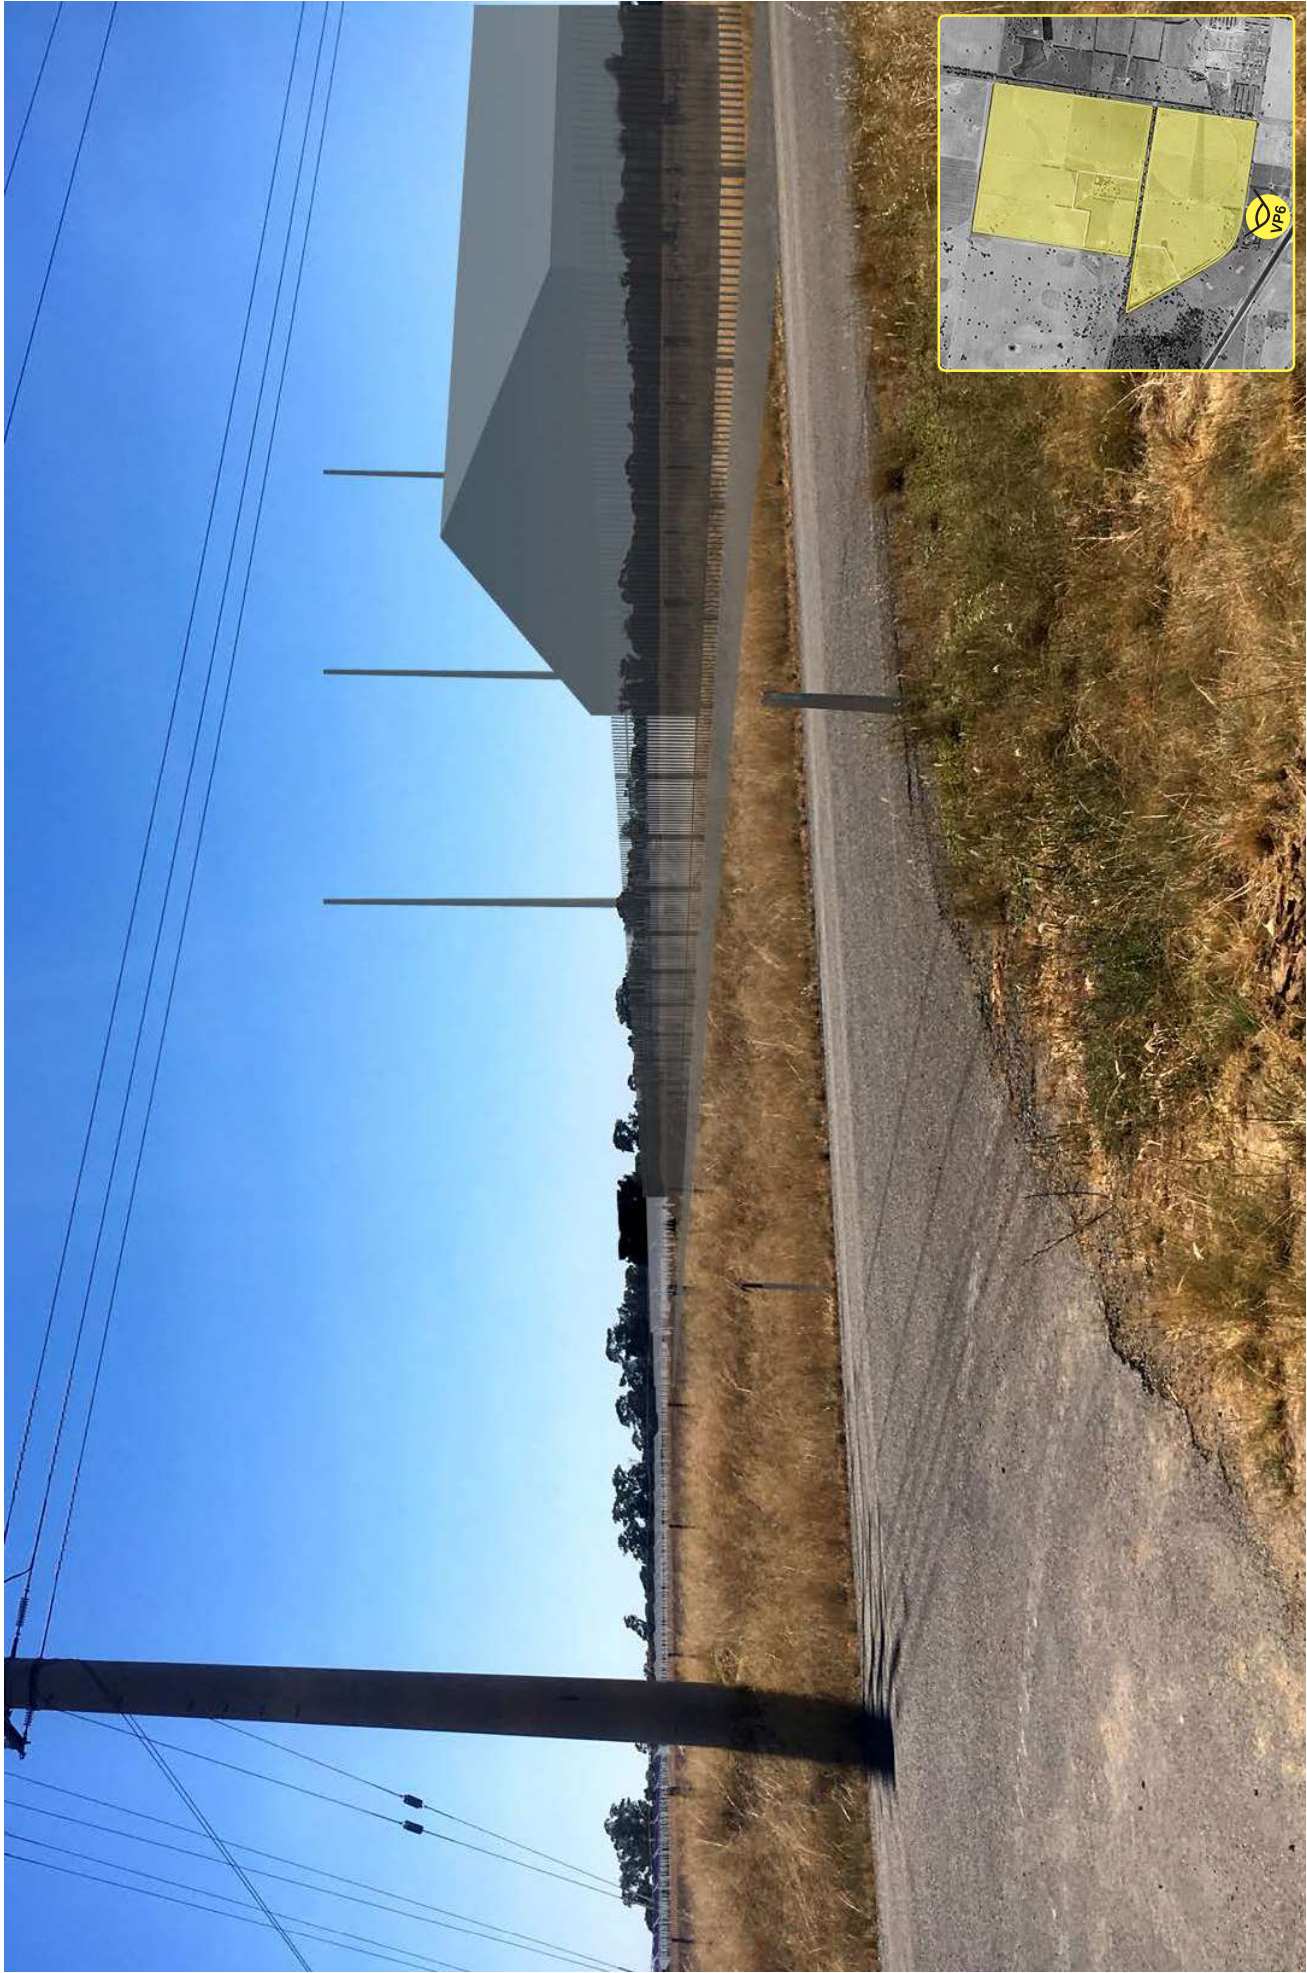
Viewpoint 6 Artist Impression: Views north towards proposal from industrial area
